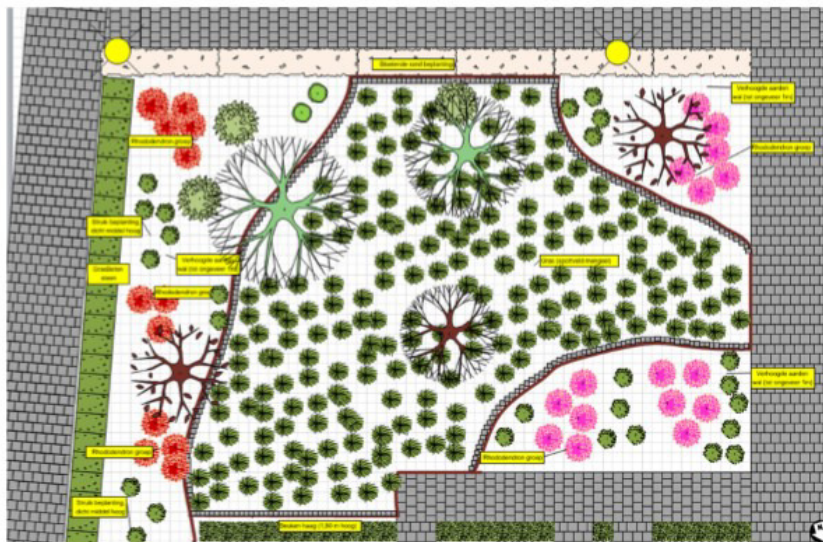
Drawing of the park (Projectplan Schoonenburg, 2011)
